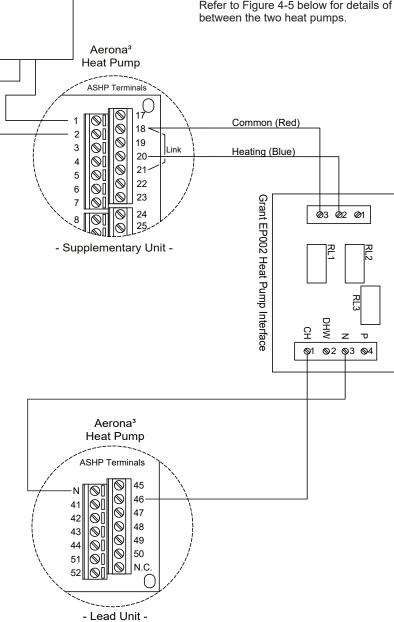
Wiring connections between lead and supplementary heat pumps
